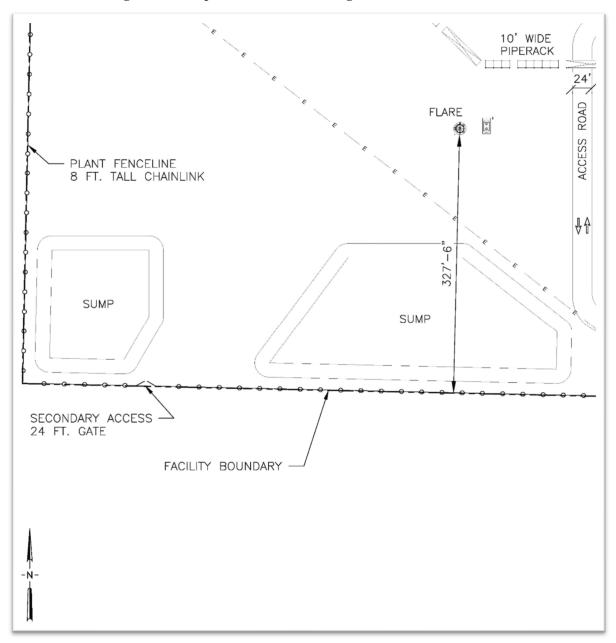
Proposed PD Plan - Enlarged Southwest Site Plan
